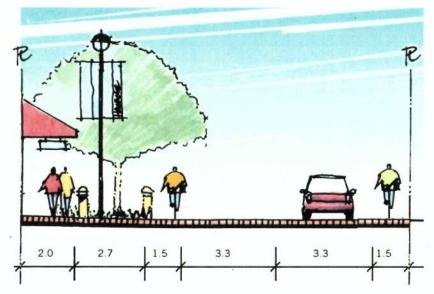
Illustrative Section across Harbour Road (Illustrating minimum streetscape widths)
